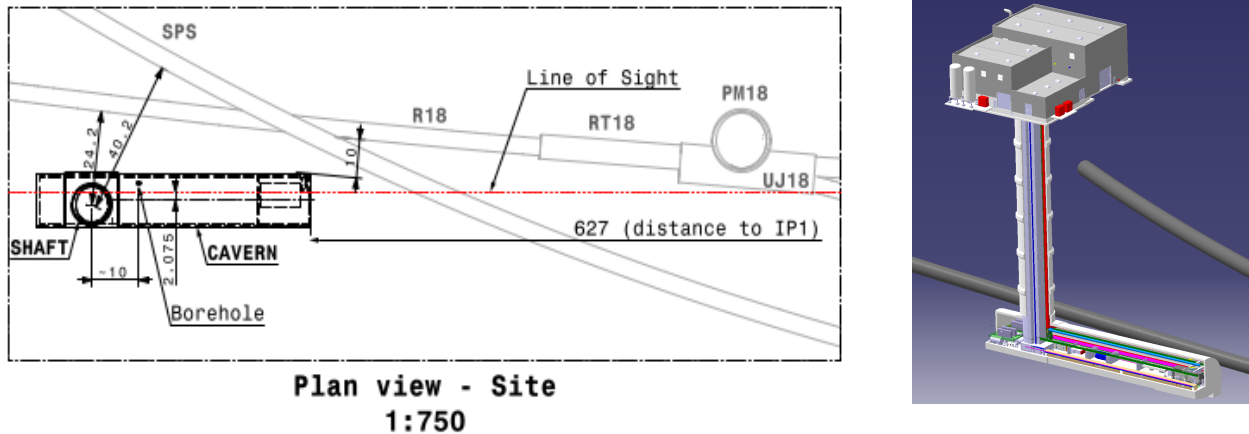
Left: Plan view showing the FPF location. Right: 3D view of the Facility.
